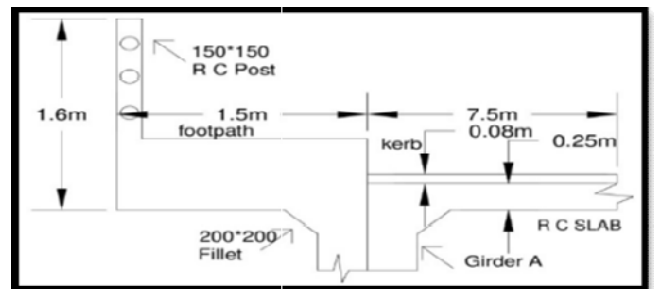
Details of footpath, parapet, kerb and deck slab
